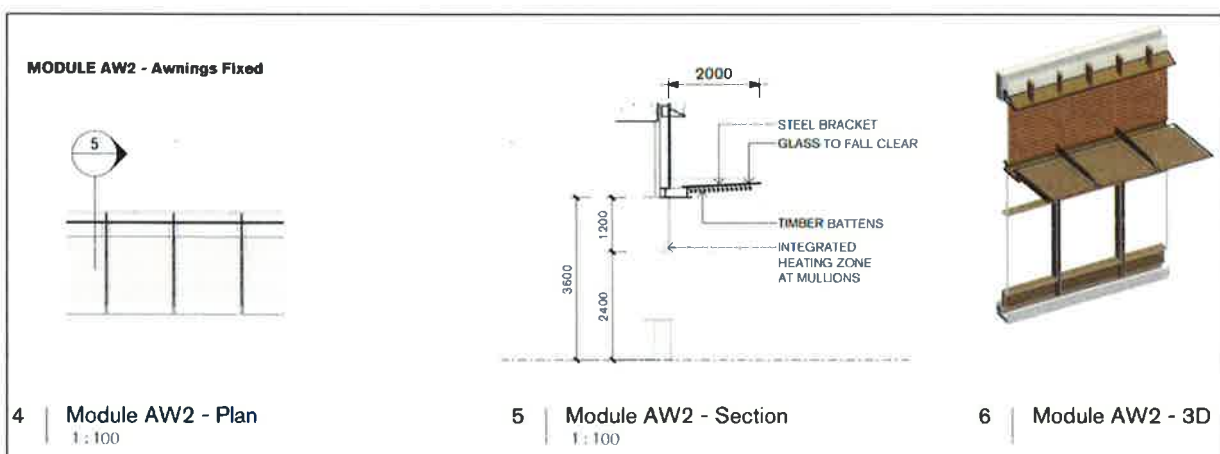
| Proposed new Shopfront Module AW2 (Source: Applicant)
